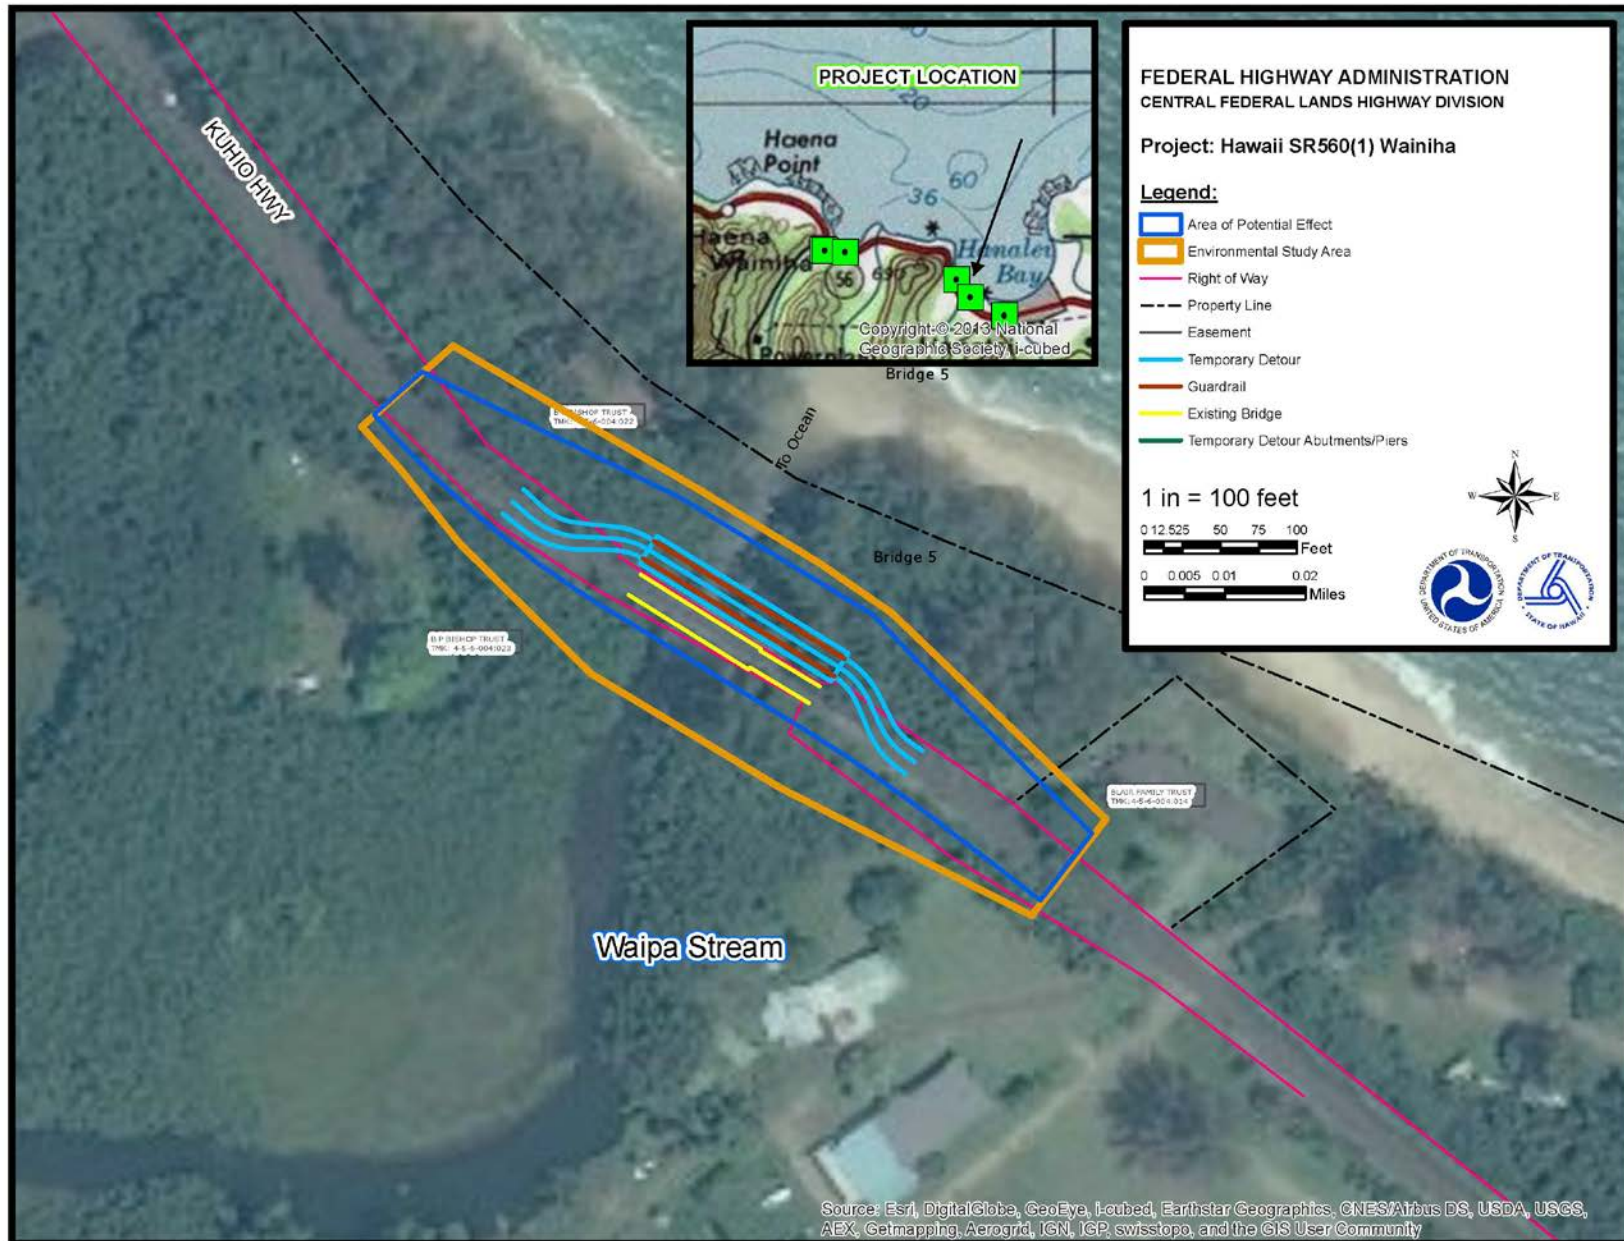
Approximate Location of Temporary Bridge at Waipa Bridge
